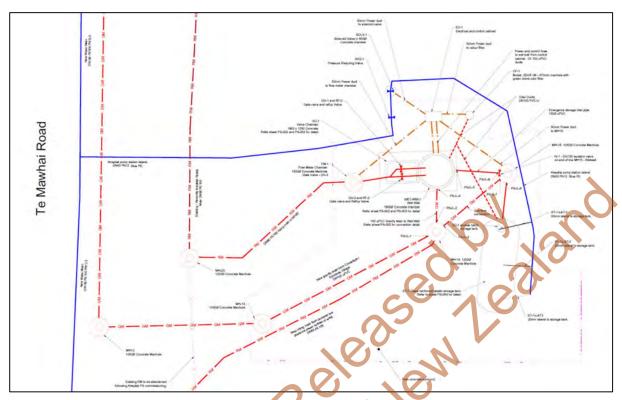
New Wastewater Pump Station Asbuilt Drawing
